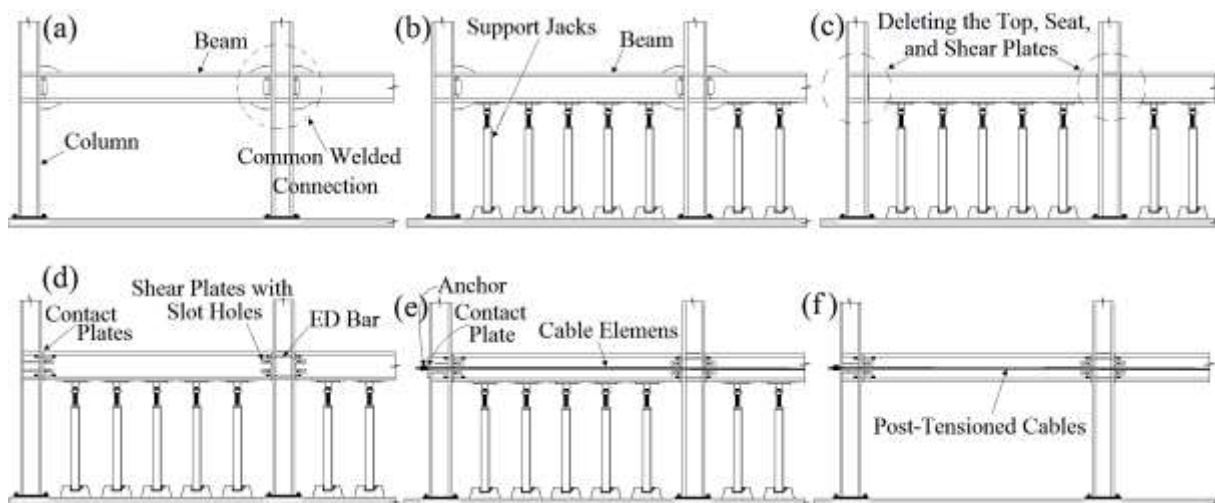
Erection details of retrofitting moment frame with welded connections using post-tensioned elements
